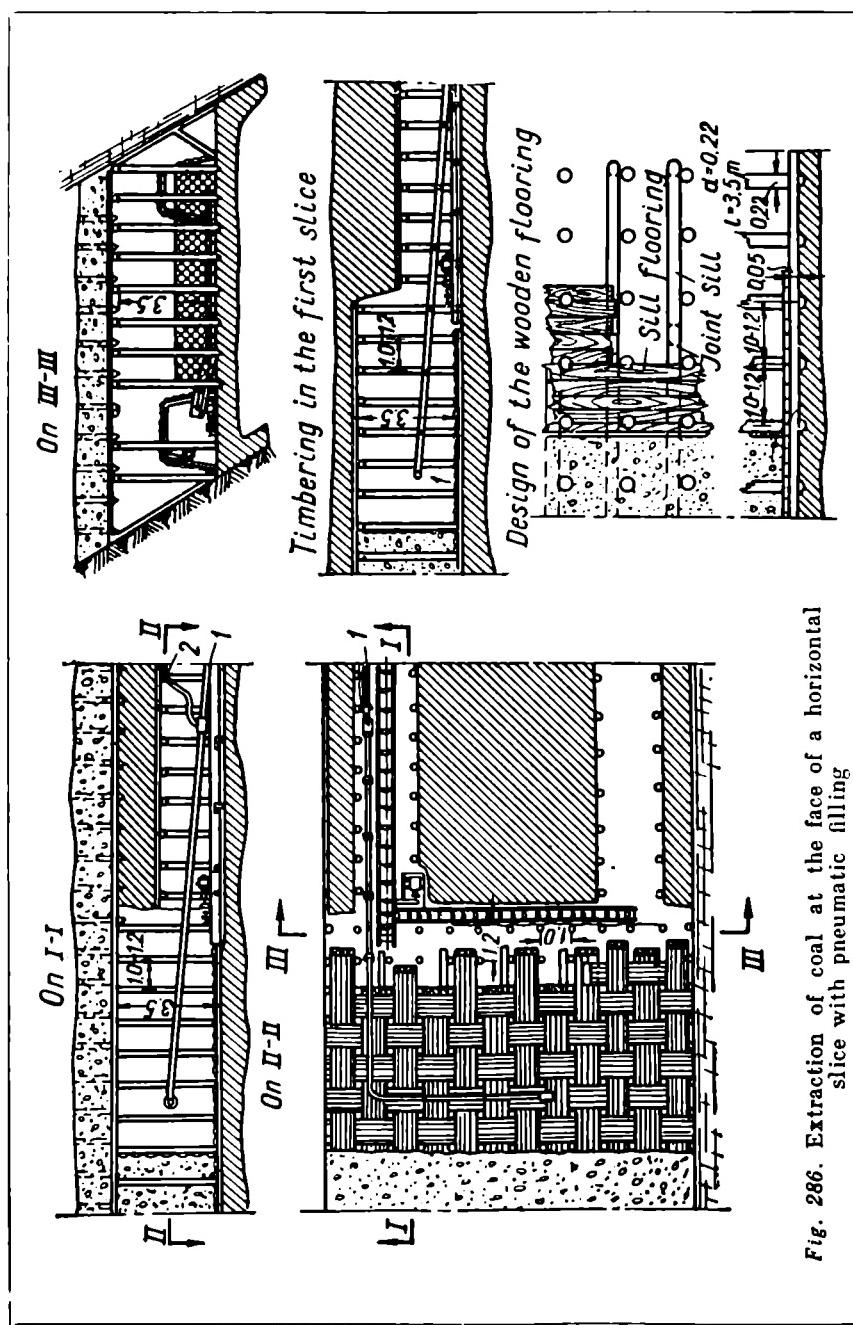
Extraction of coal at the face of a horizontal slice with pneumatic filling
